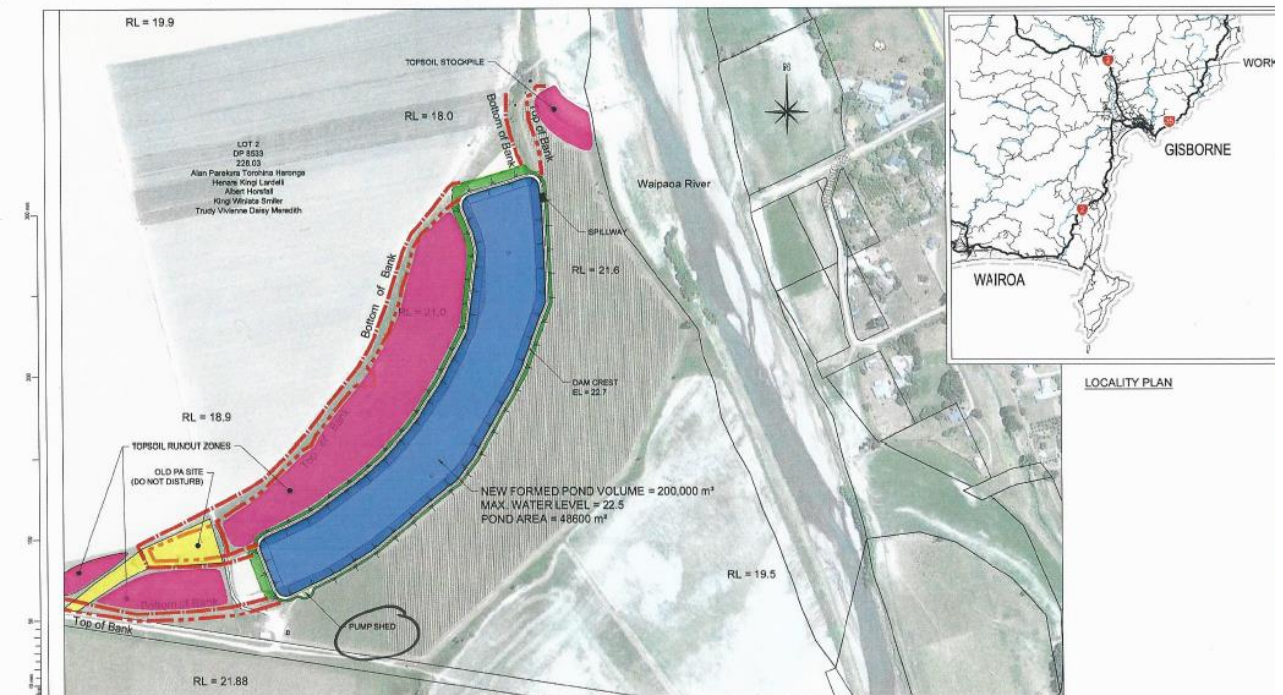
Plan showing irrigation pond (blue) and Waipaoa River to right
